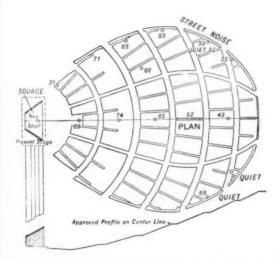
Plan and section of the Orchestra Shell for the Hollywood Bowl
